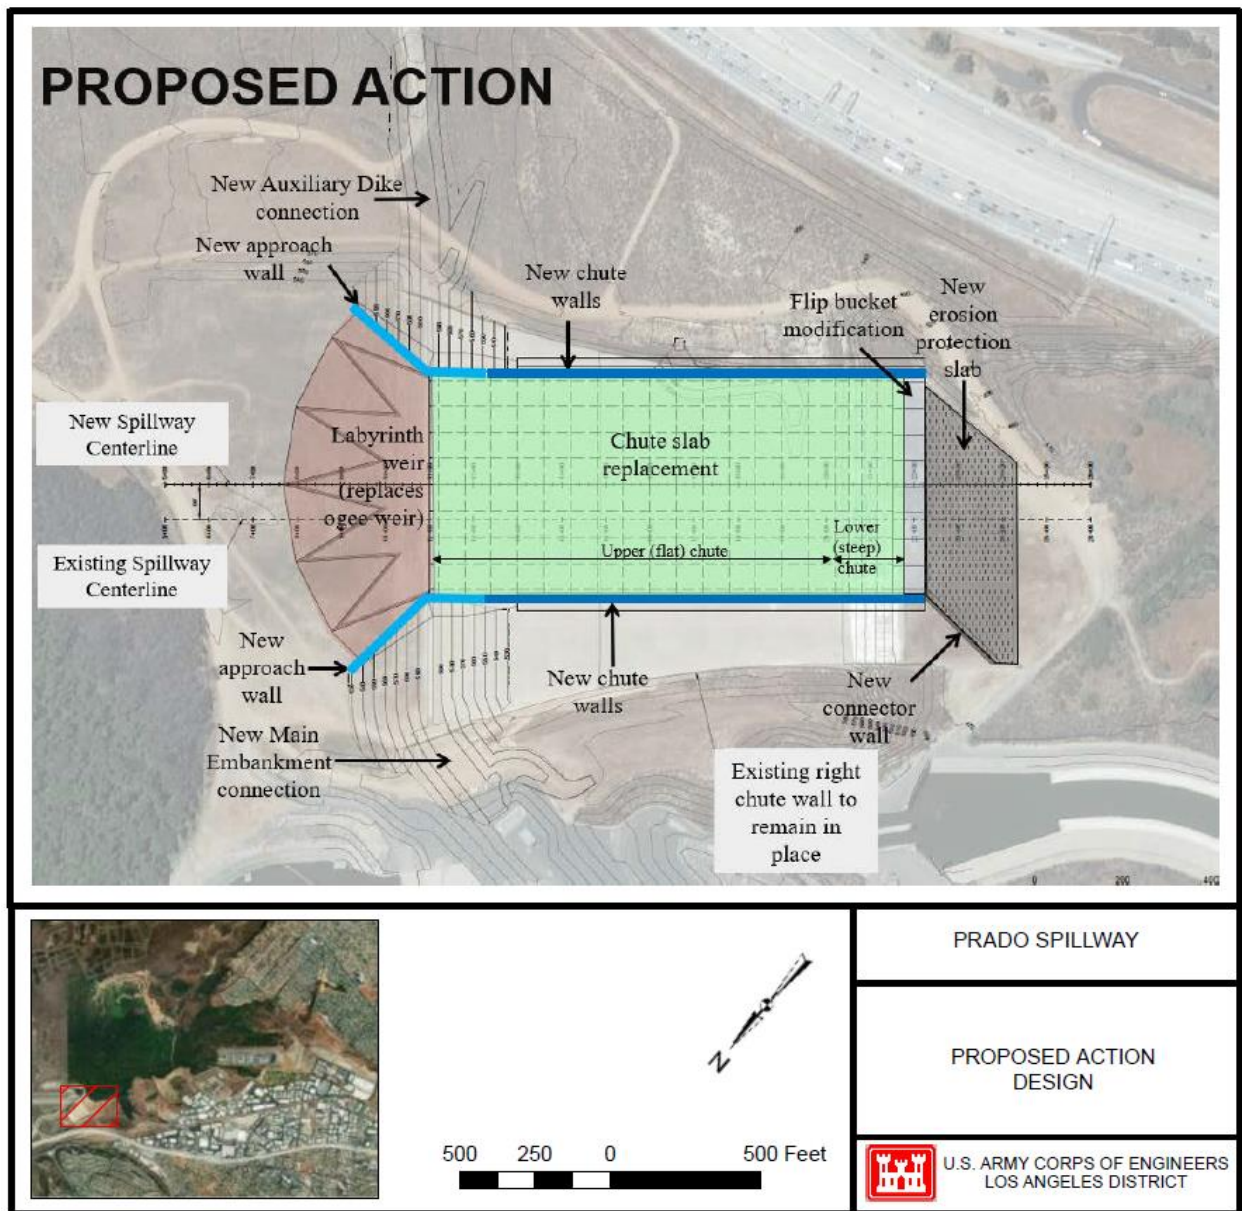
Alternative 1 (Proposed Action) Conceptual Design
